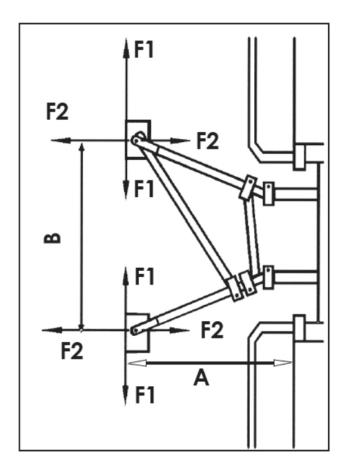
Wall anchorage instructions for minichassis
